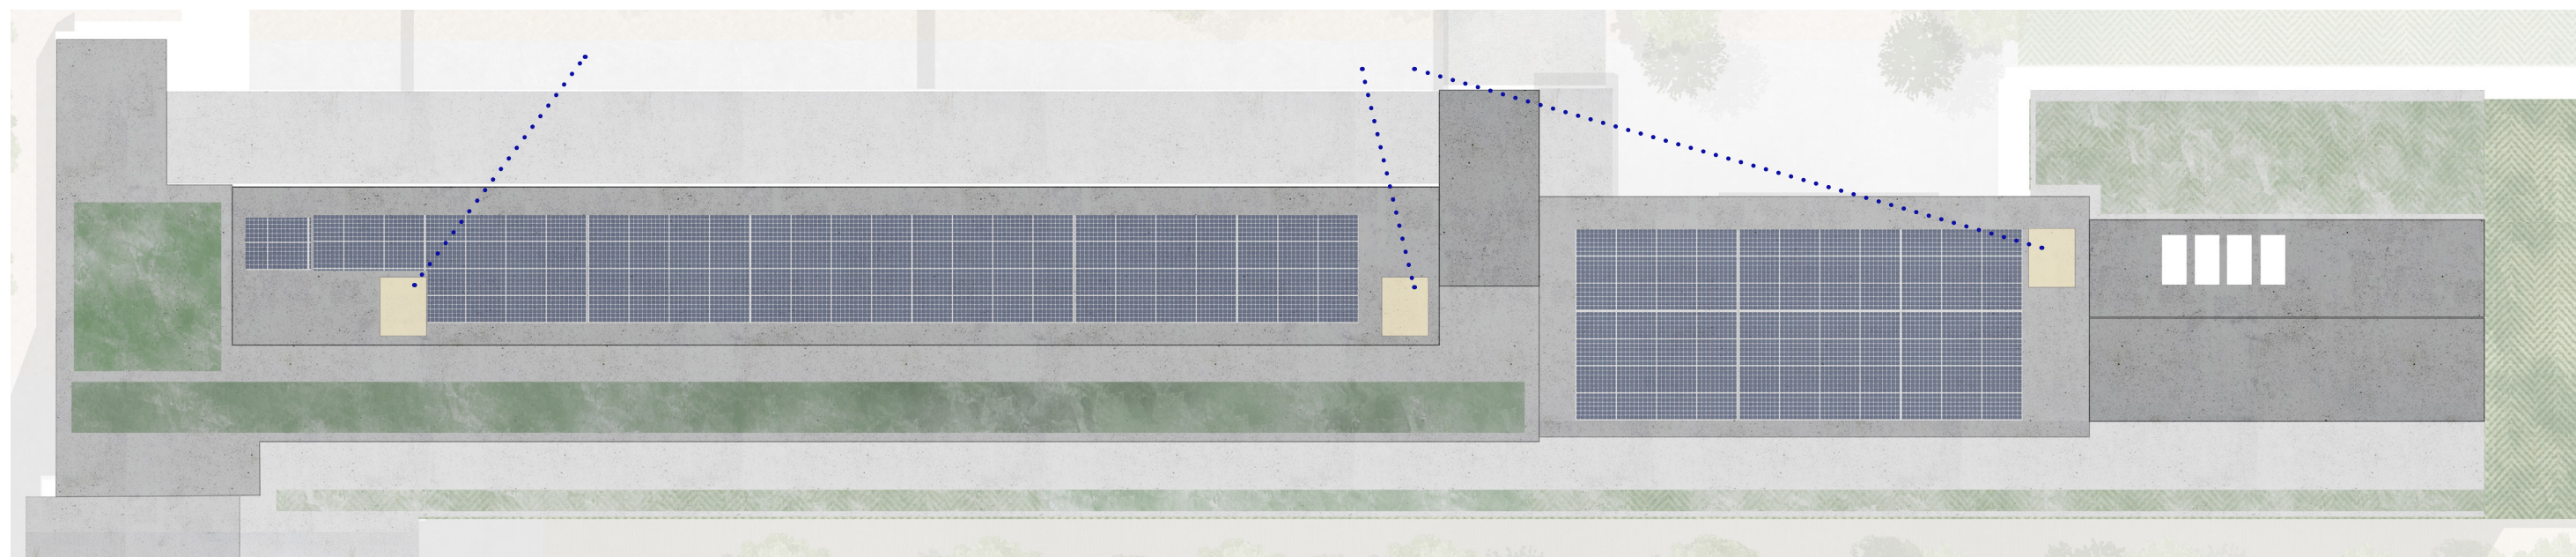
Roof plans highlighting installations placement for HVAC units, solar panels and green roofs)
